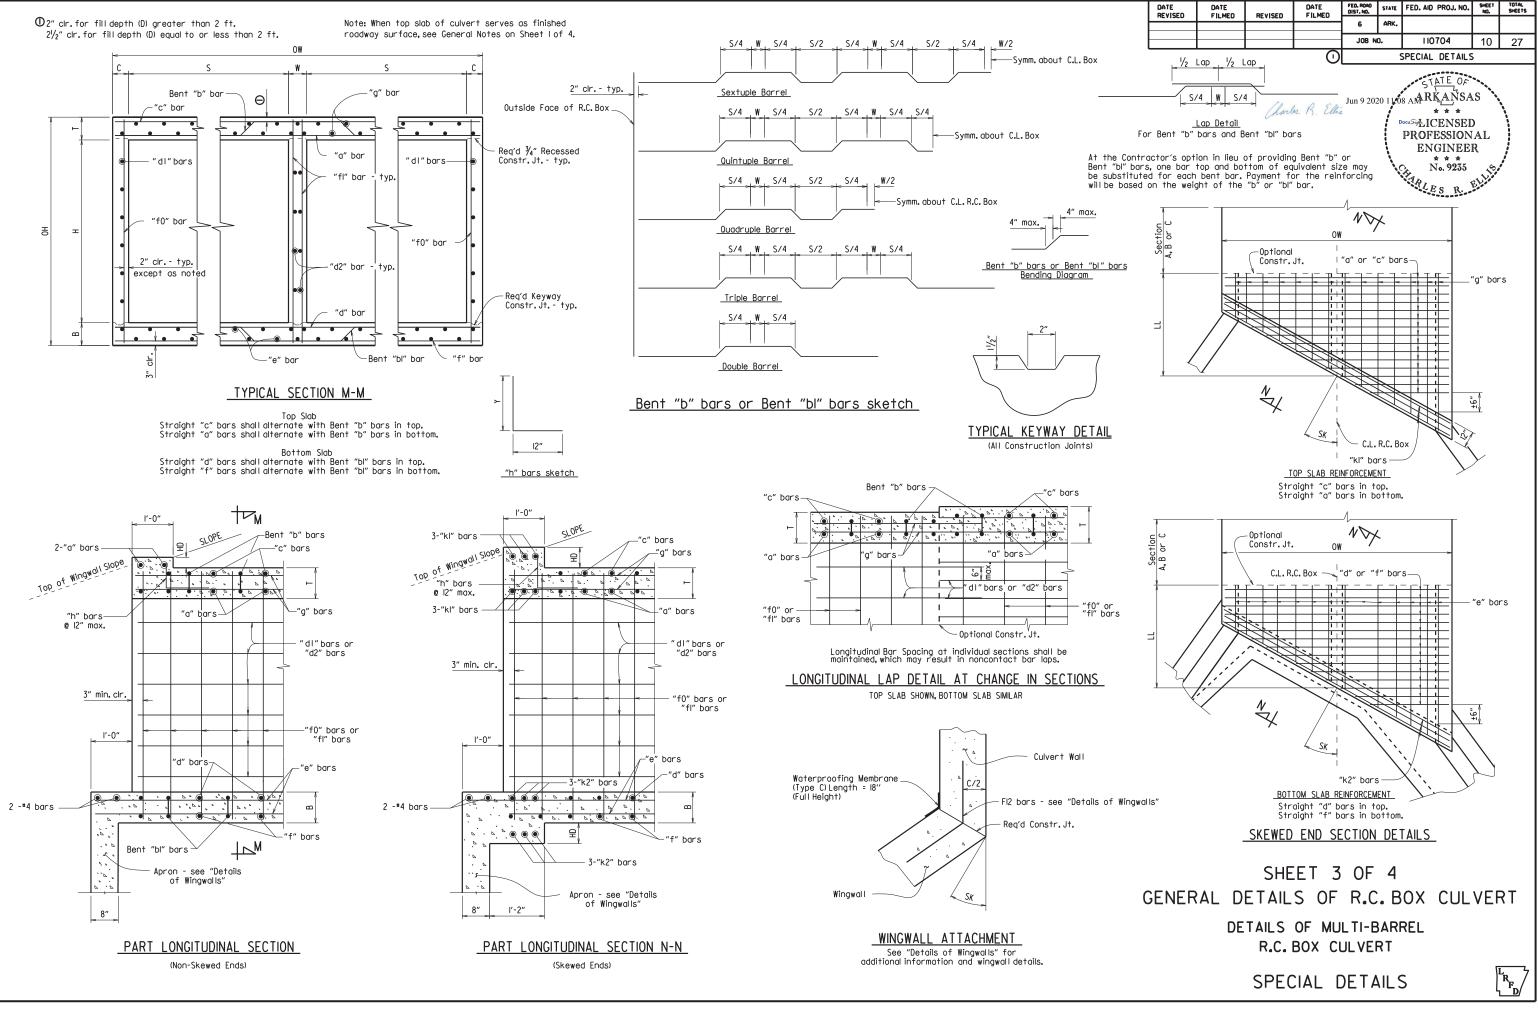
DETAILS OF R.C. BOX CULVERT DOUBLE BARREL BOX CULVERT Sta. 107+12
